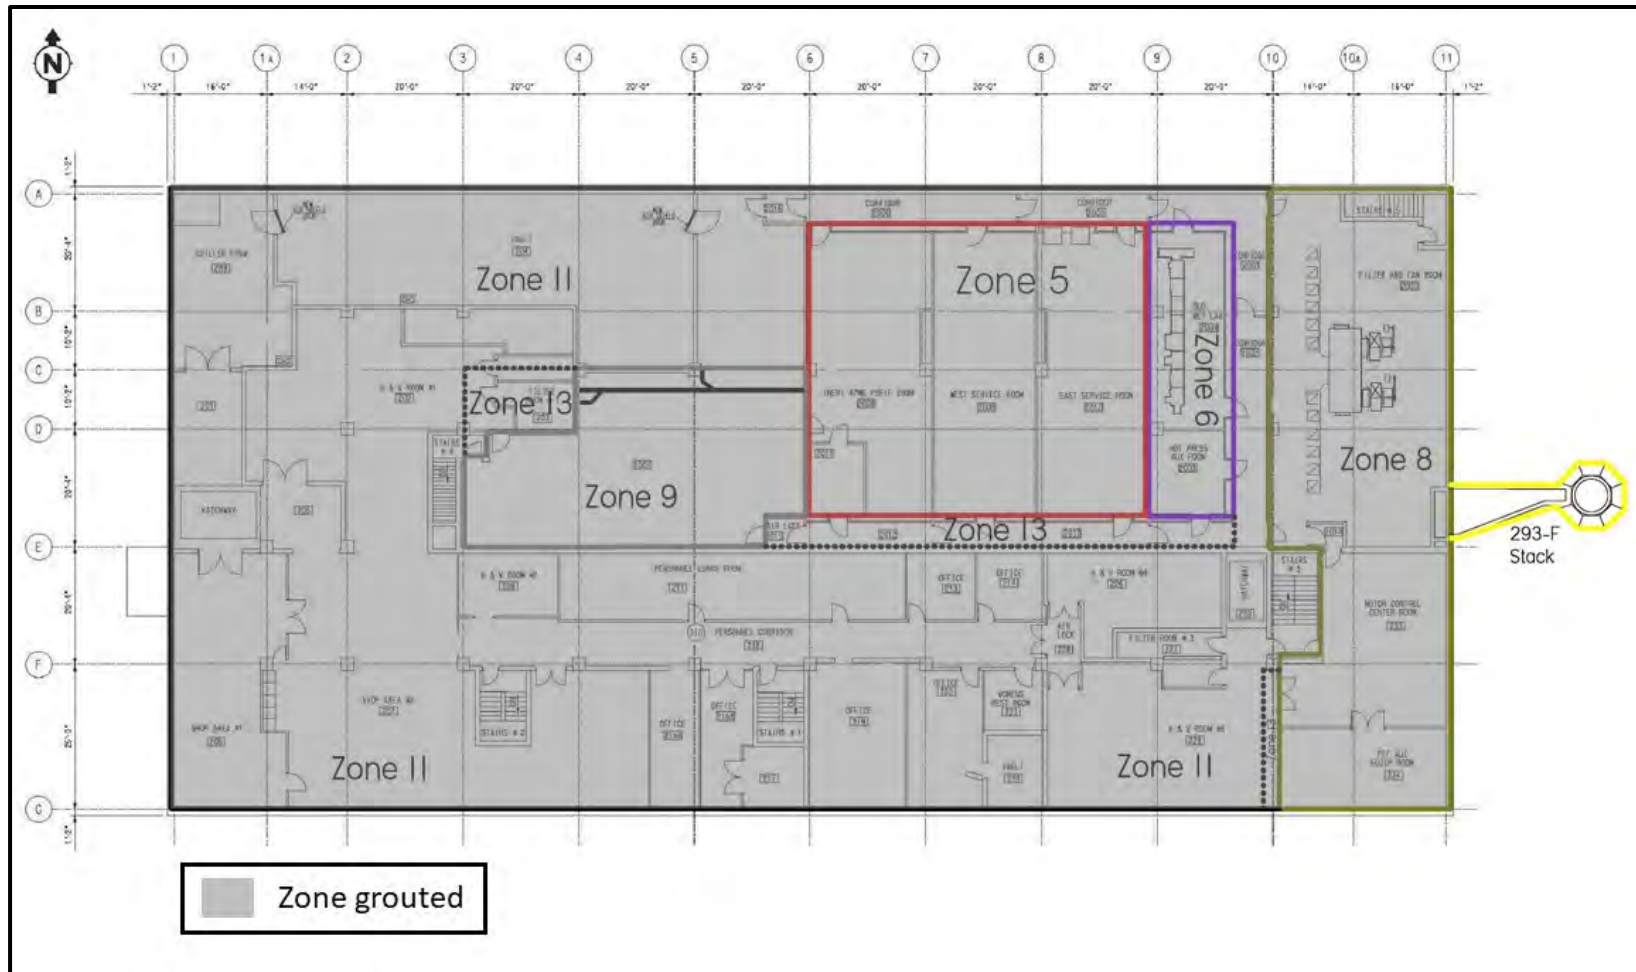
Alternative A-3 – ISD of Entire Building 235-F /Engineered Roof (Second Level View)
